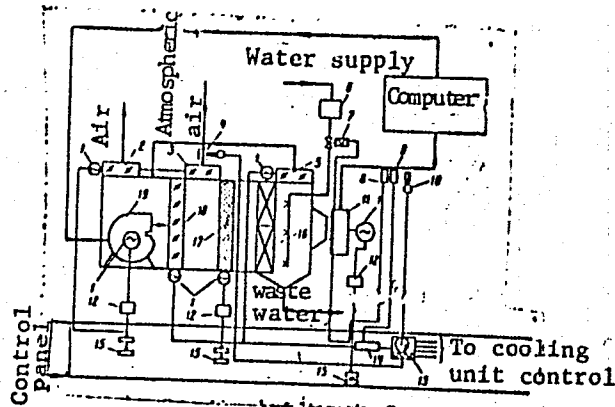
Air-conditioning system with surface air coolers (schematic drawing)
